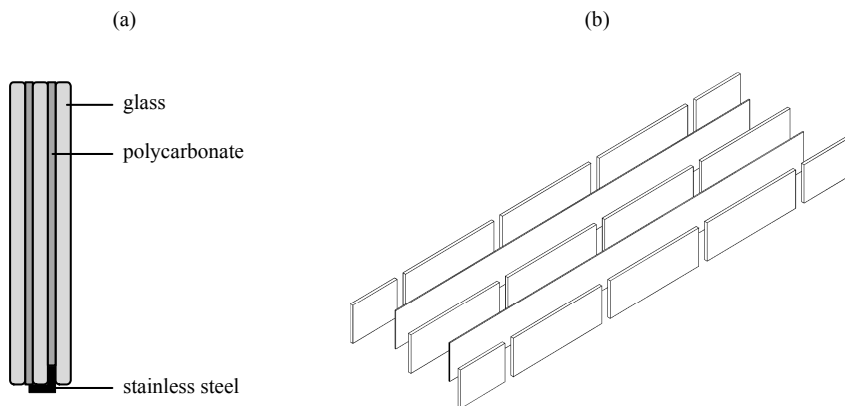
(a) Schematic cross-section of the glass-PC laminated beam with additional reinforcement section. Image based on [Veer et al., 2003a]. (b) Segmentation scheme applied for the glass-polycarbonate beam.
